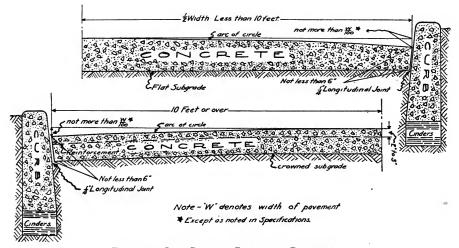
ONE-COURSE CONCRETE PAVEMENT.
